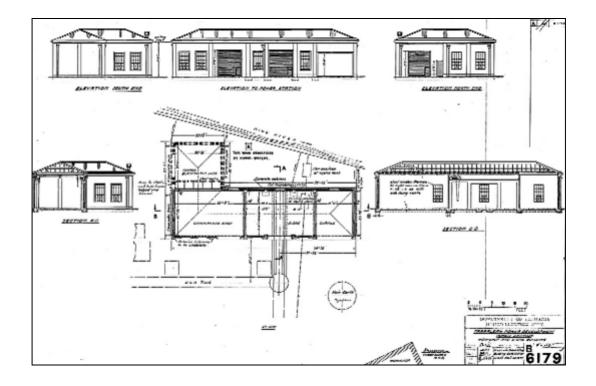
Plan and elevations of workshops and garage/store adjacent to the switchyard showing blacksmith's wing, which was washed away in the 1939 floods (HEC plans - B6179).
